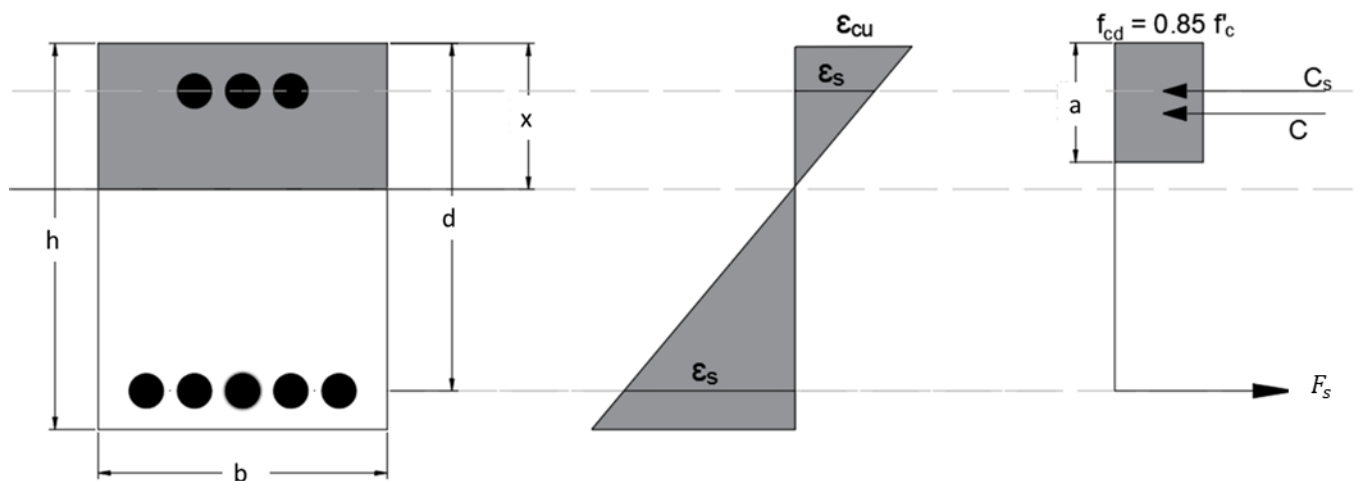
Rectangular stress block considering compression reinforcement [8]
